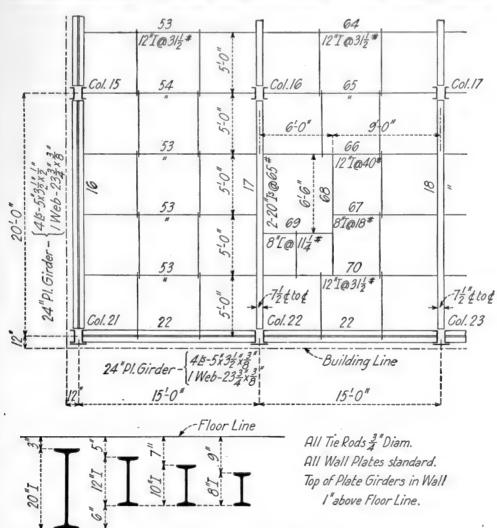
FLOOR PLANS FOR OFFICE BUILDINGS.
